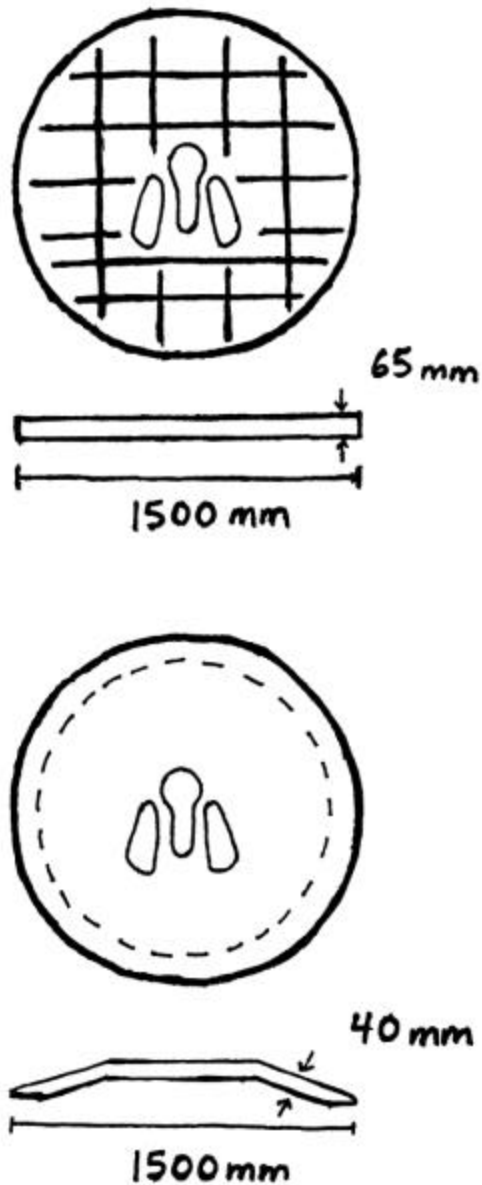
Plan Views and Cross-sections of Reinforced (top) and Unreinforced (bottom) Concrete Slabs
